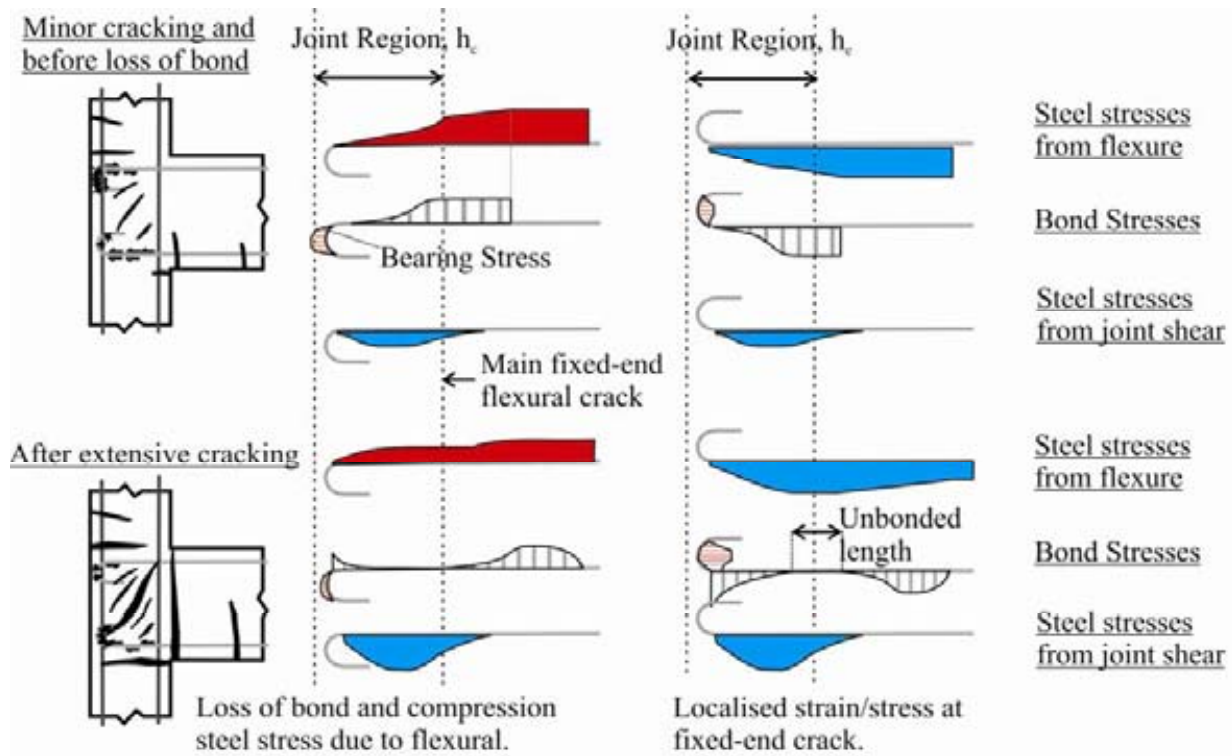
Assumed steel and bond stresses distribution along the beam longitudinal reinforcement anchored into joint with under Pull loading: top) uncracked/small crack scenario; bottom) large flexural crack scenario. Bond stresses are not drawn to scale and are exaggerated for clarity.
